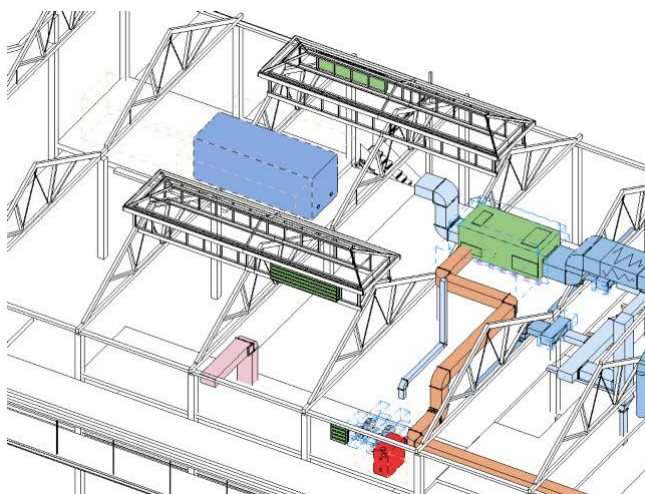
3D showing central roof plan, by ARUP.²⁰
